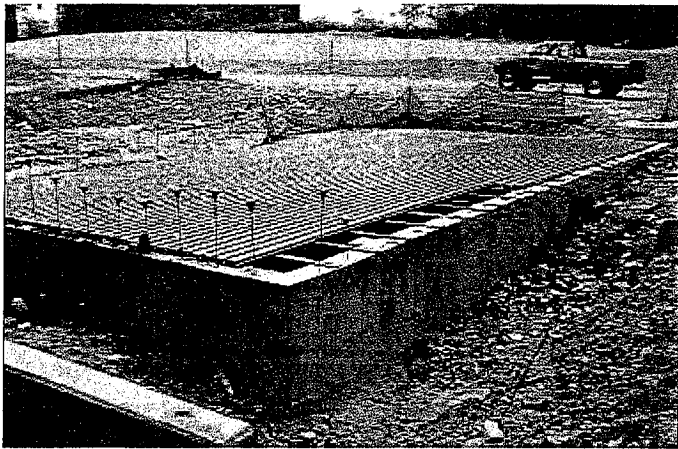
Example of Underground Concrete Vault for Stormwater Detention.
